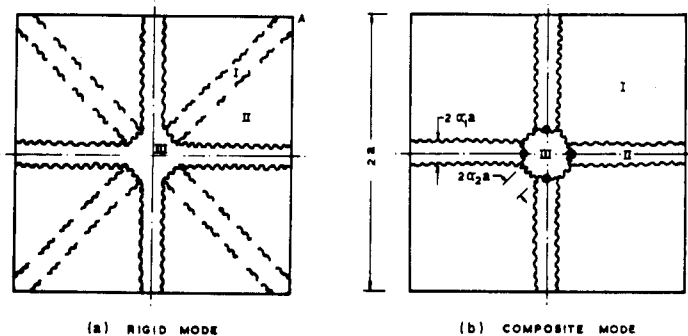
Failure modes in axis beam-slab footings.
